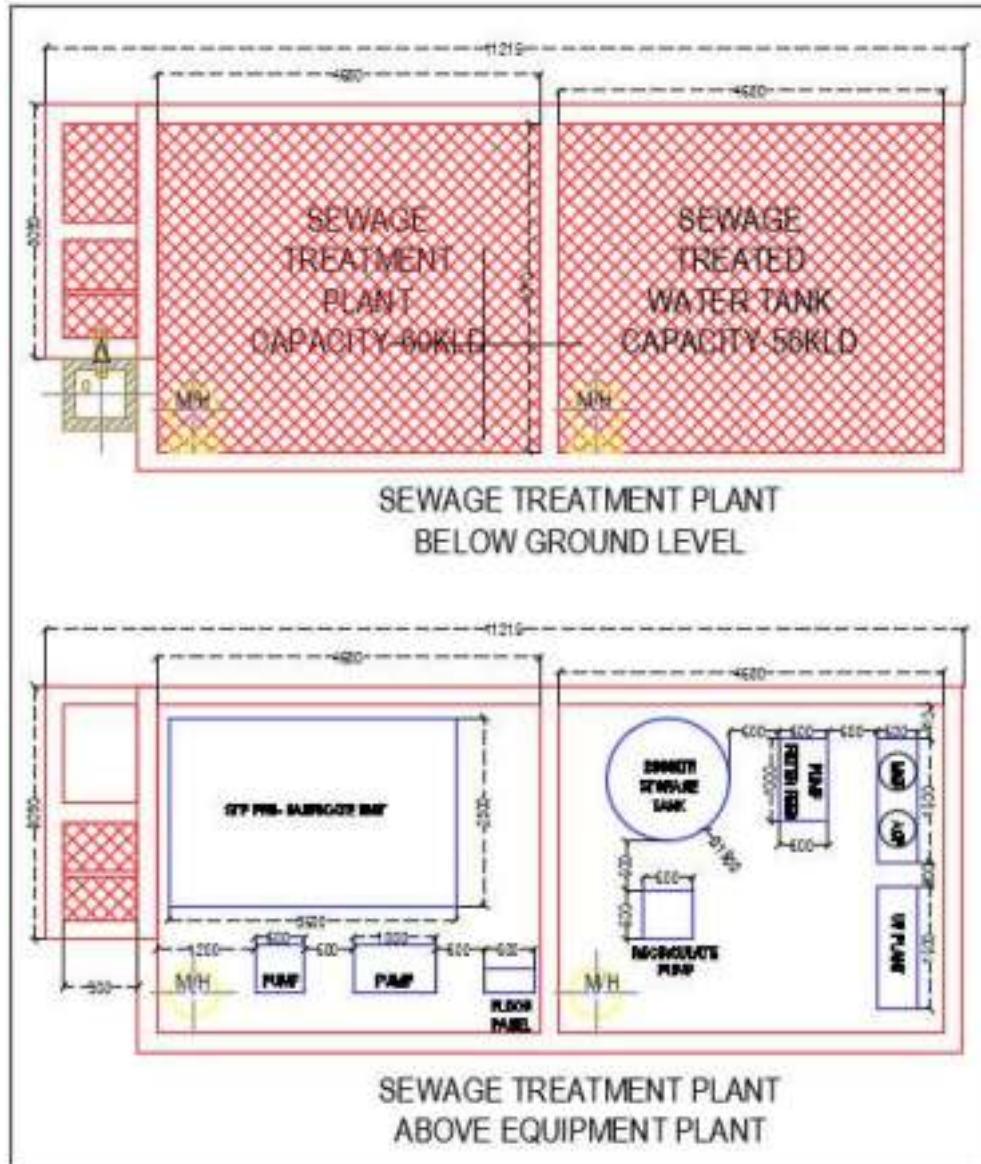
LAYOUT OF PROPOSED STP & EQUIPMENT PLANT
